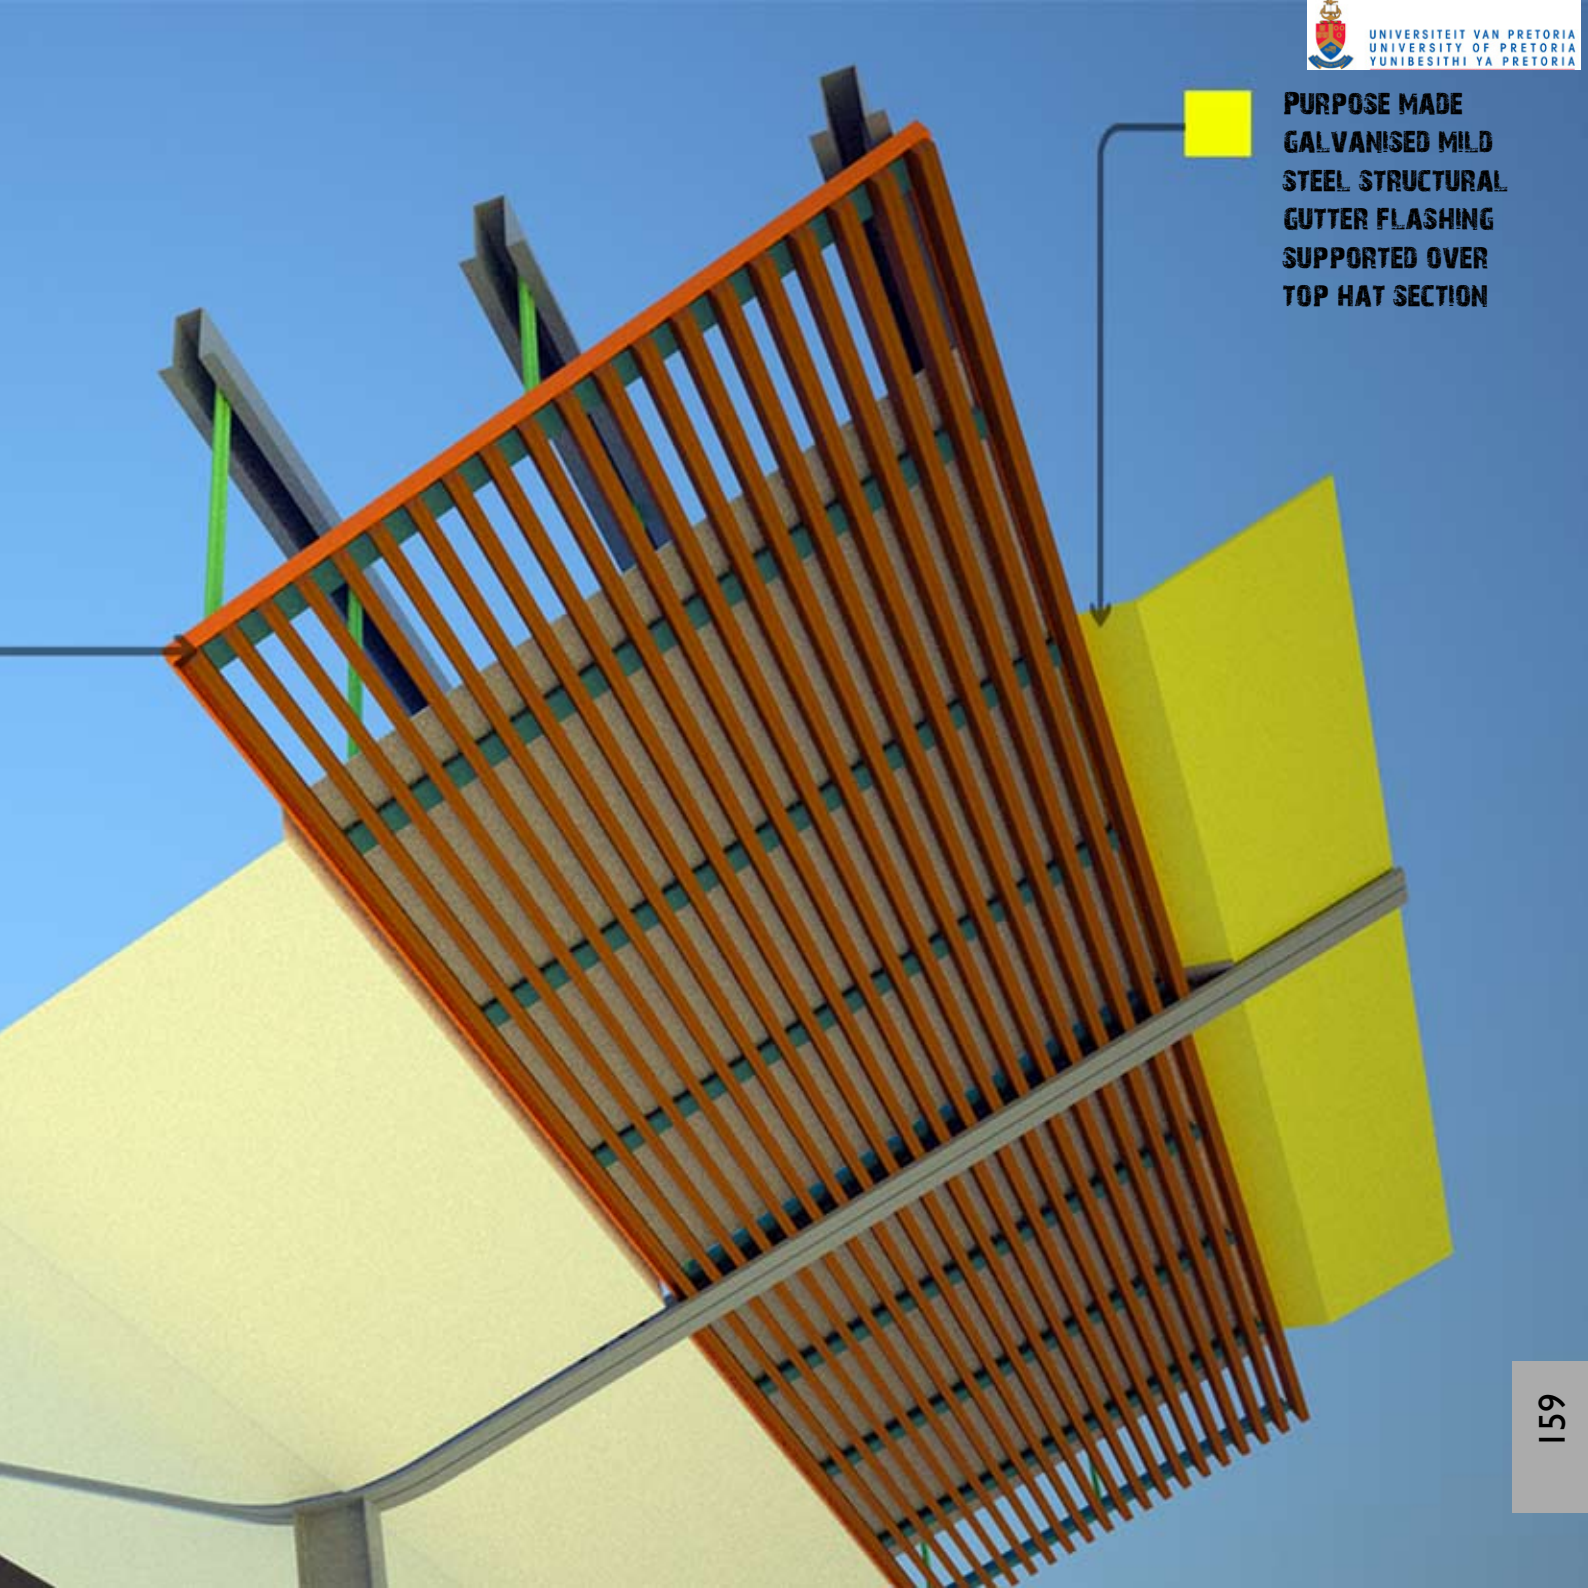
Three dimensional suspended timber and steel ceiling detail
